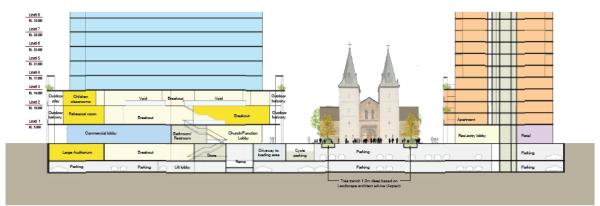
Section showing development option 3 (Source: Planning proposal)
